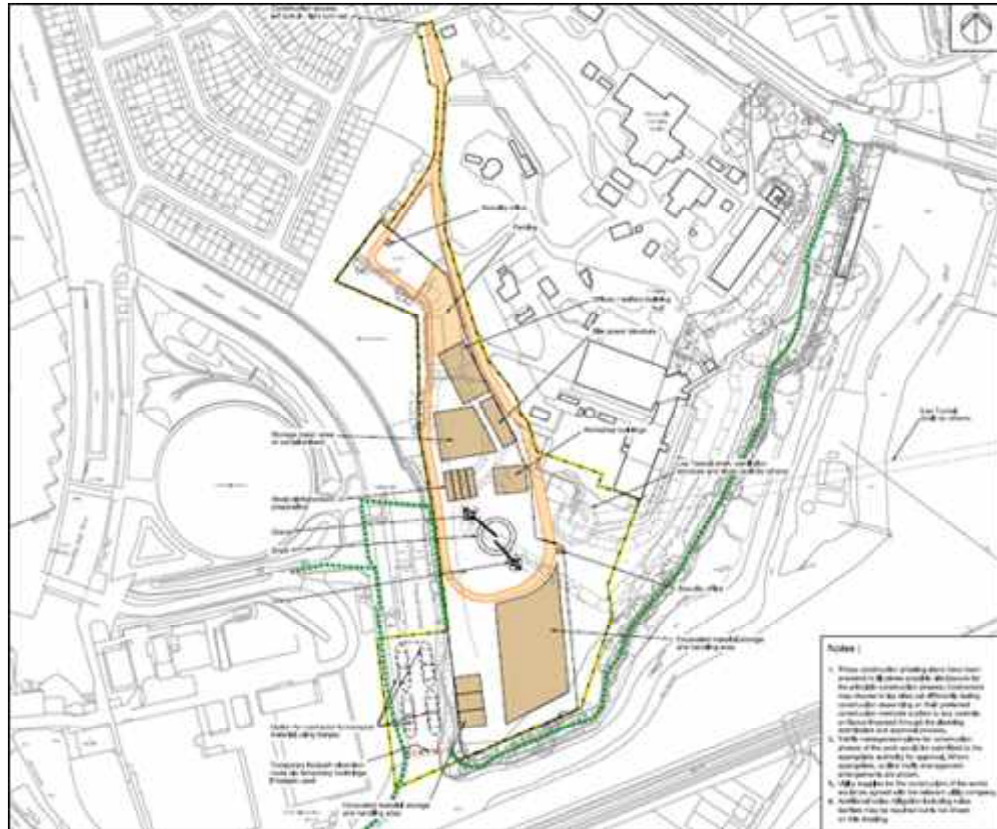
DCO proposal (*Abbey Mills Pumping Station - Book of Plans Doc. Ref 2.27*)
